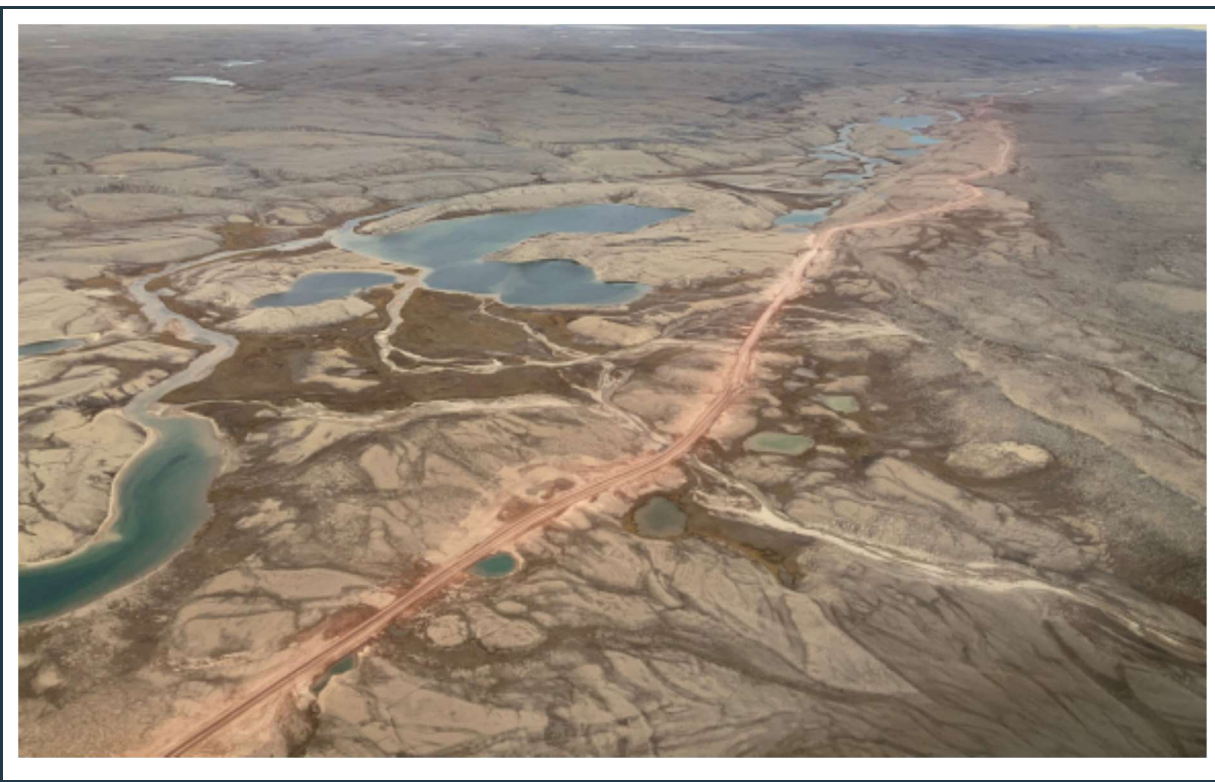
View of a section of the Tote Road between the Mary River Mine and Milne Inlet Port.
